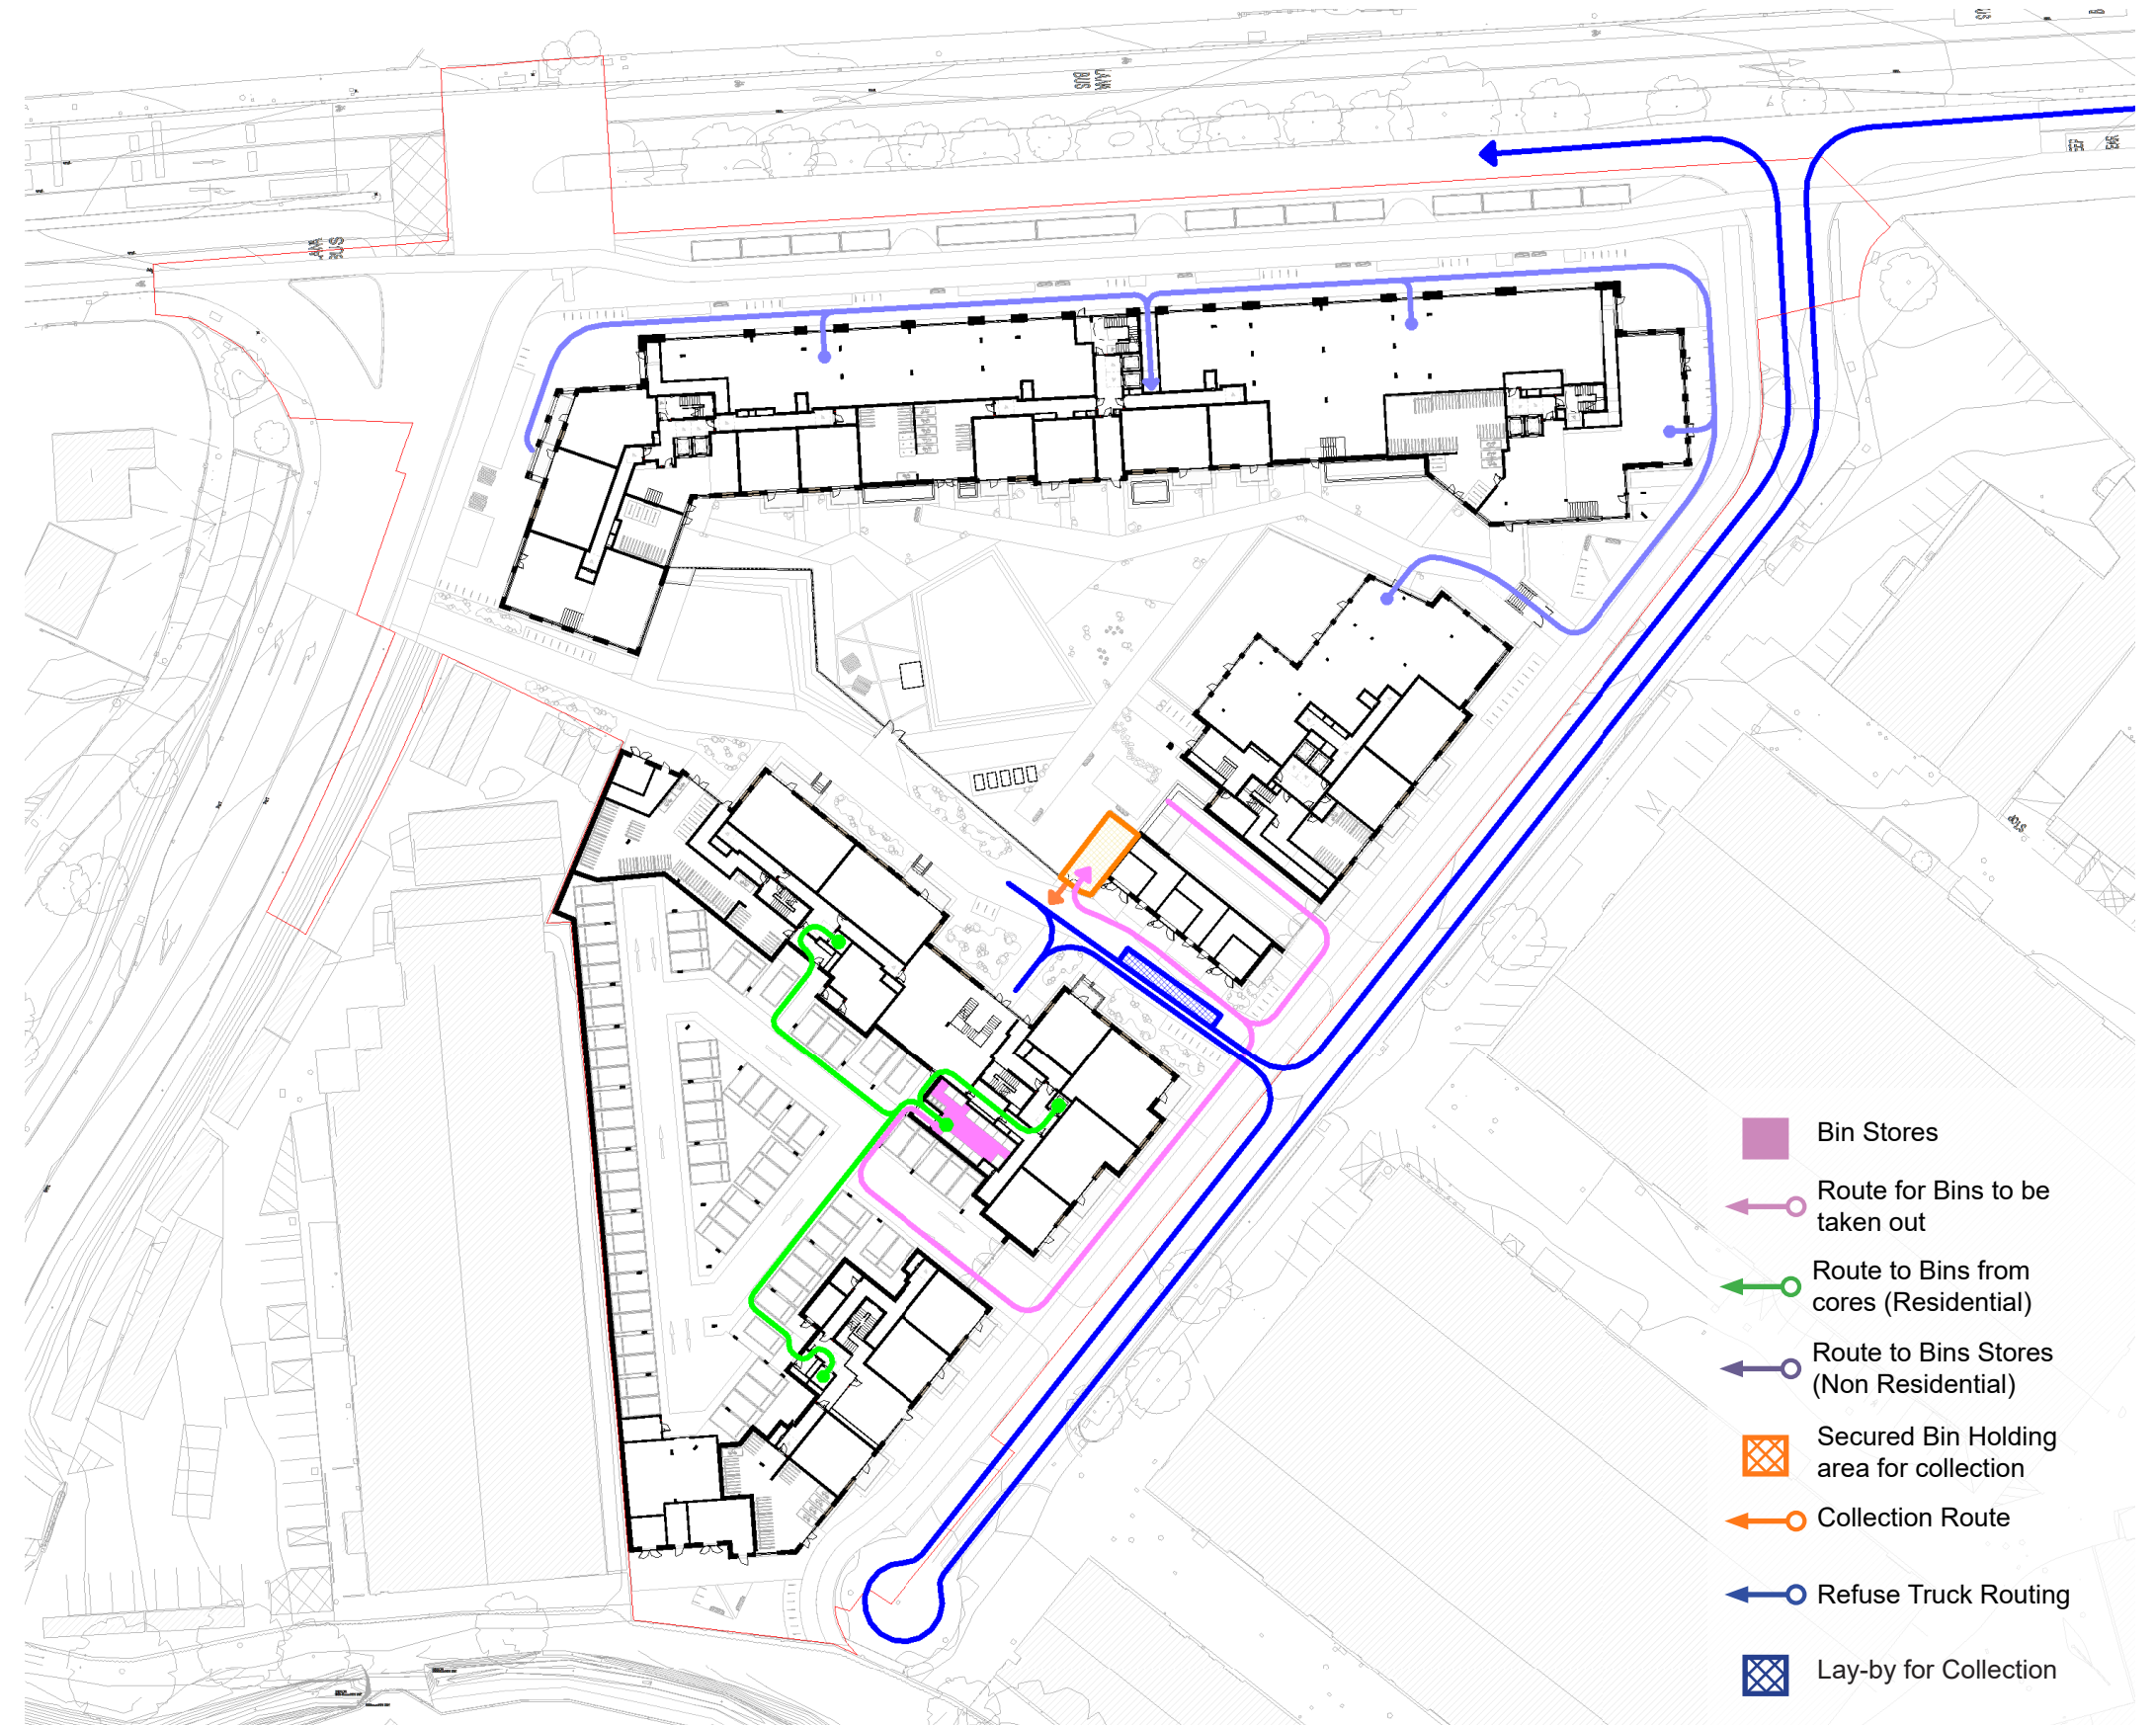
Ground floor plan showing waste storage areas for building D and waste collection strategy.
